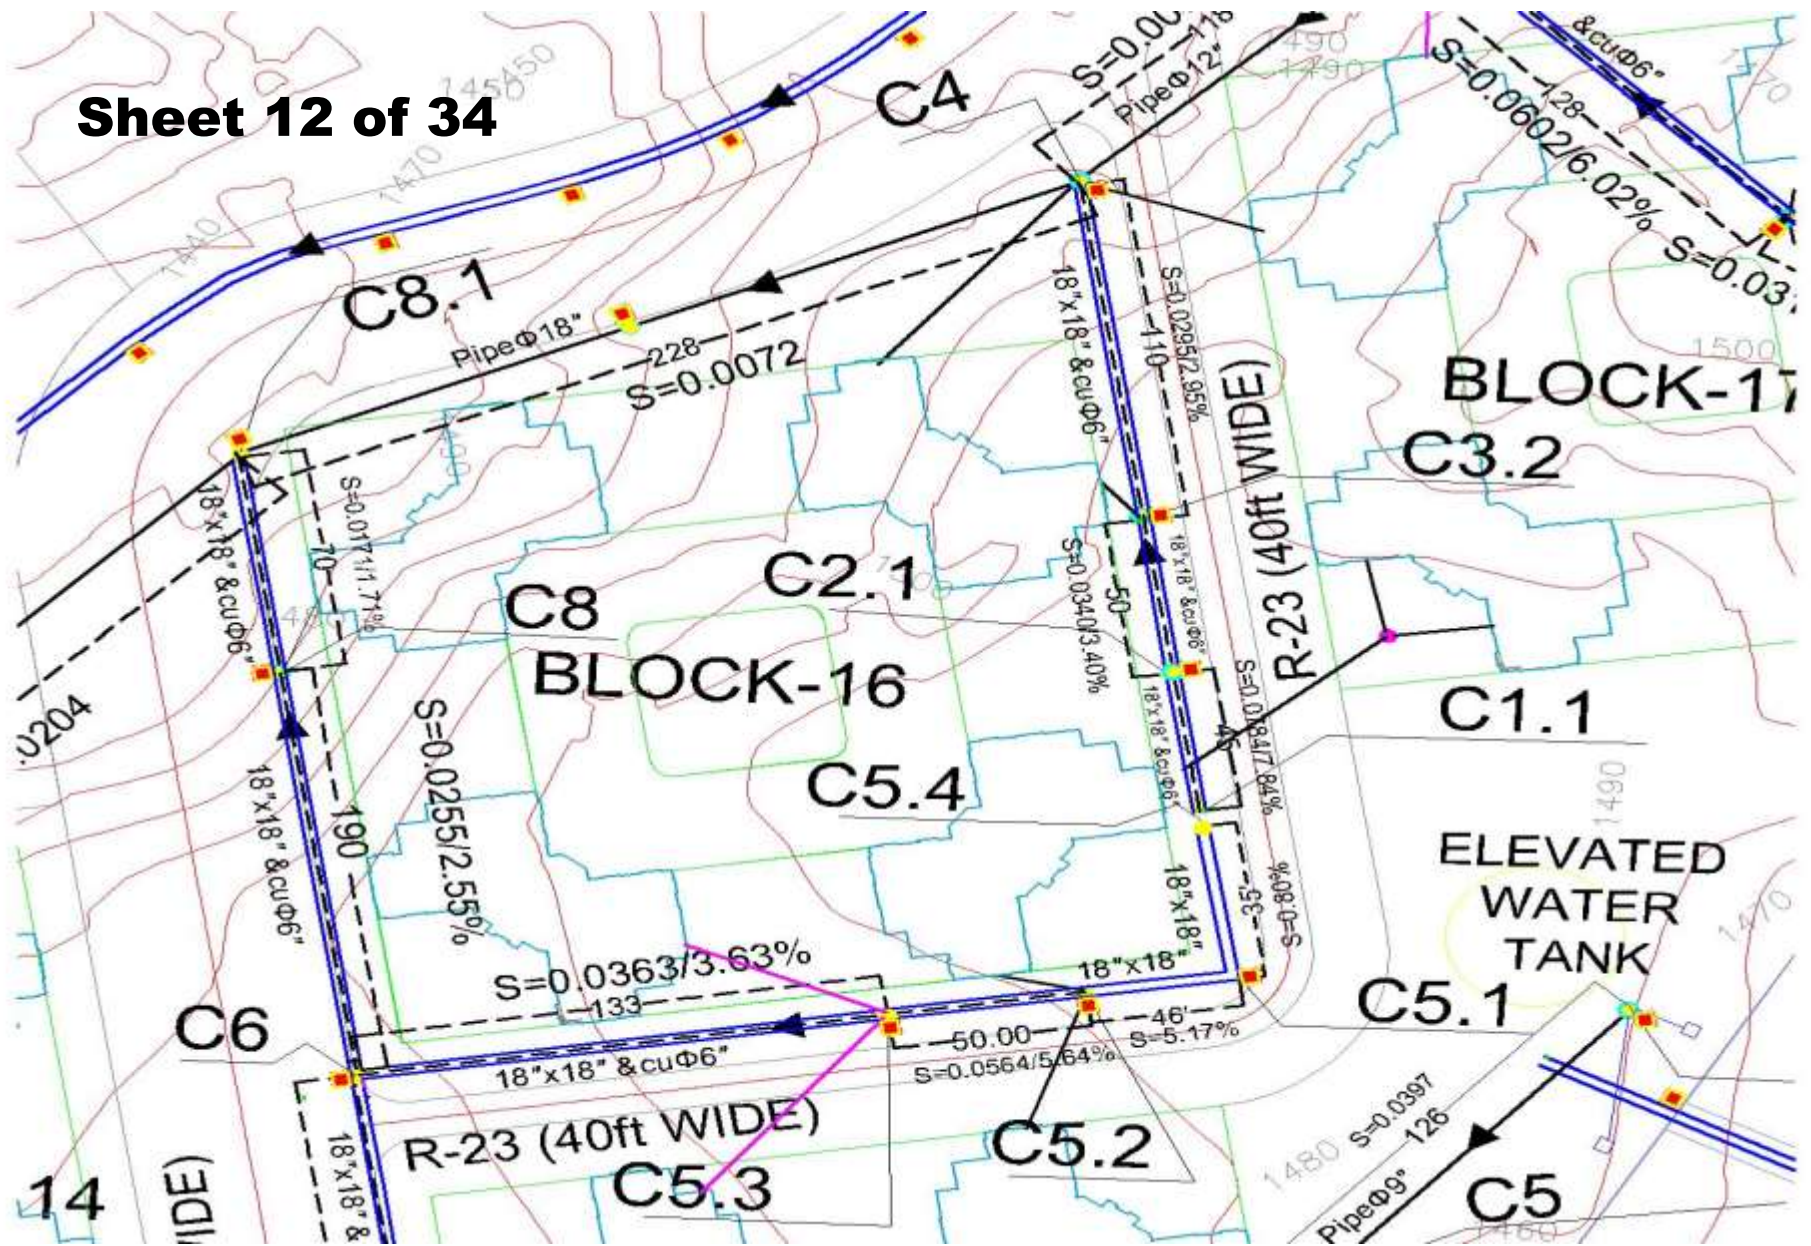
Combined drainage layout plan of Zone-3 along R-22 & R-23
